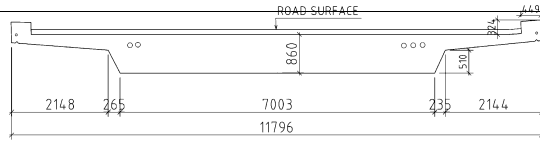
Cross section of the Haavistonjoki Bridge concrete deck (dimensions in mm)
